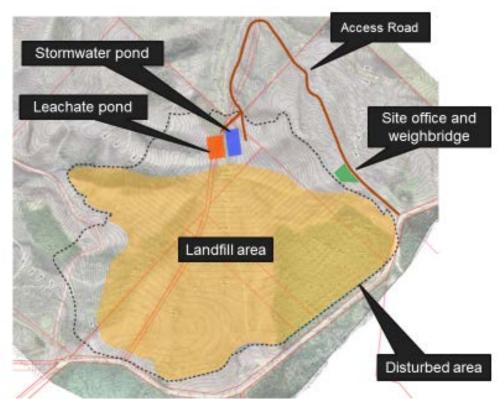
Possible Landfill Site Layout at Smooth Hill
